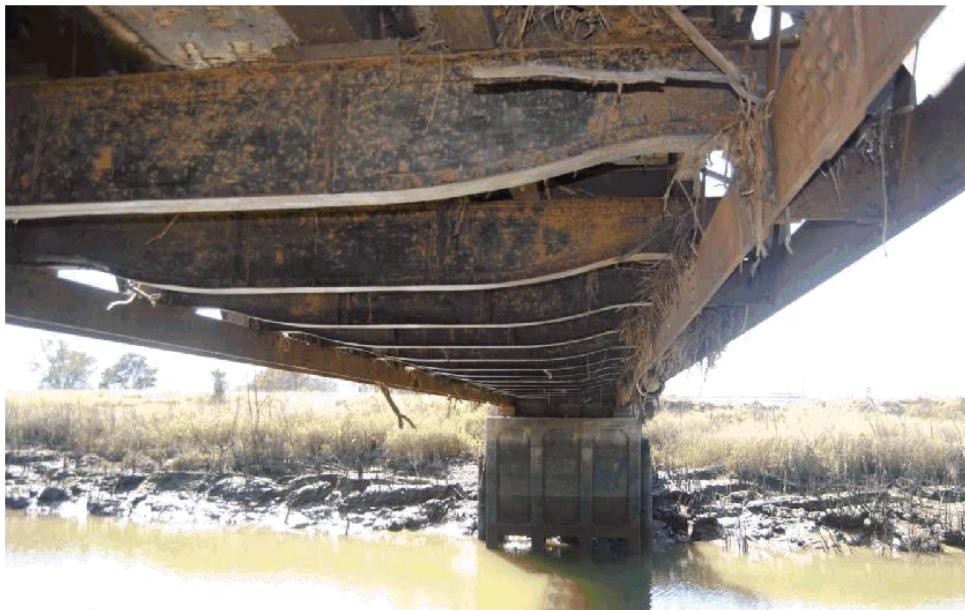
View of structure from underneath (Span 2), looking towards Pier 2 (taken from 2013 inspection)
